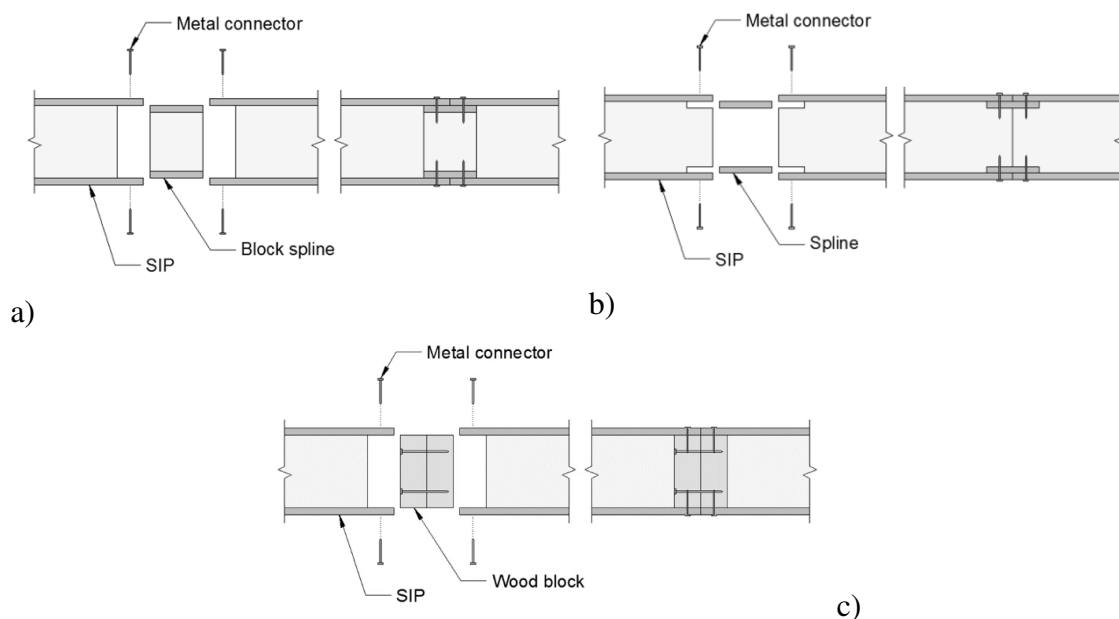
Spline connection between SIP panels: a) SIP block; b) wood layer; c) wood block.
